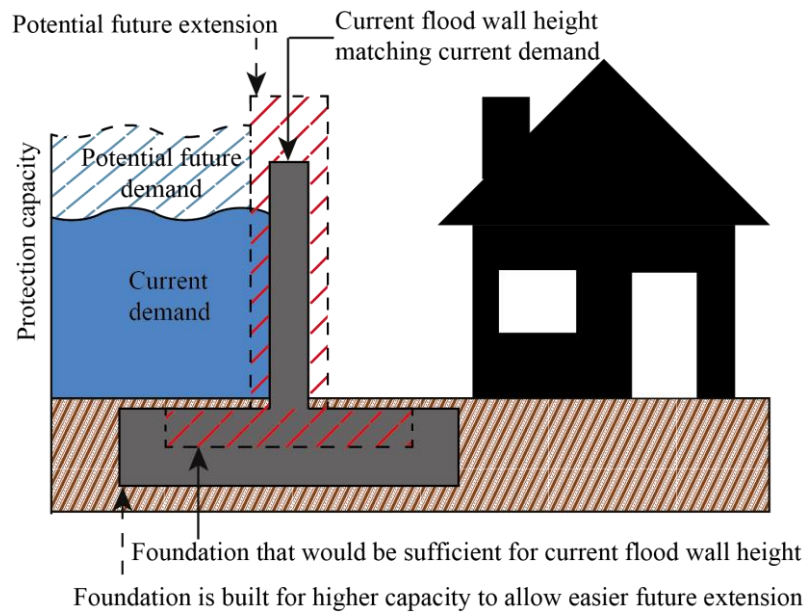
An example of a flexible flood protection measure – a flood wall. When it is built with a broader base initially, it is cheaper to adjust (i.e. more flexible) later. Adapted from (Vrijling et al., 2007).
